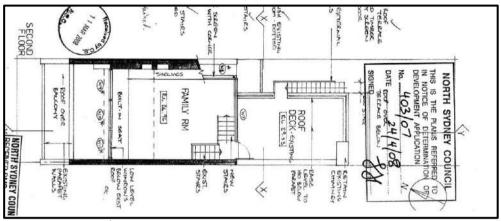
2nd floor plan (showing roof terrace) of approved development
